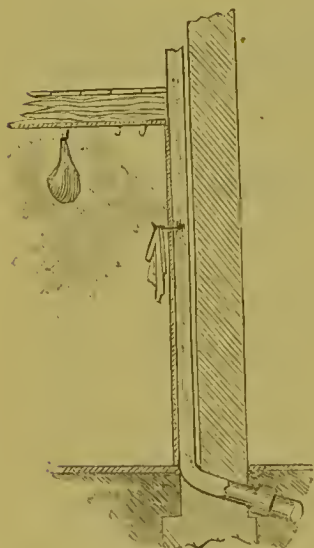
Nail driven into Soil-pipe in Larder Wall.
